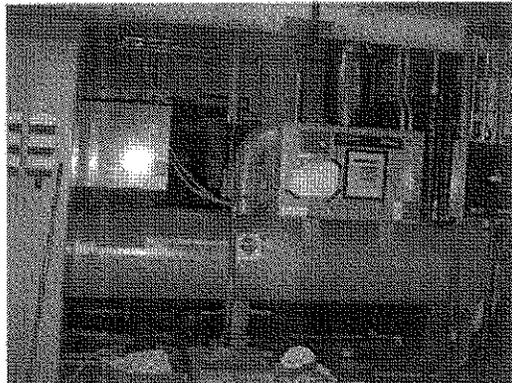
Trane Chiller installed 1997 (Section 7.1)
